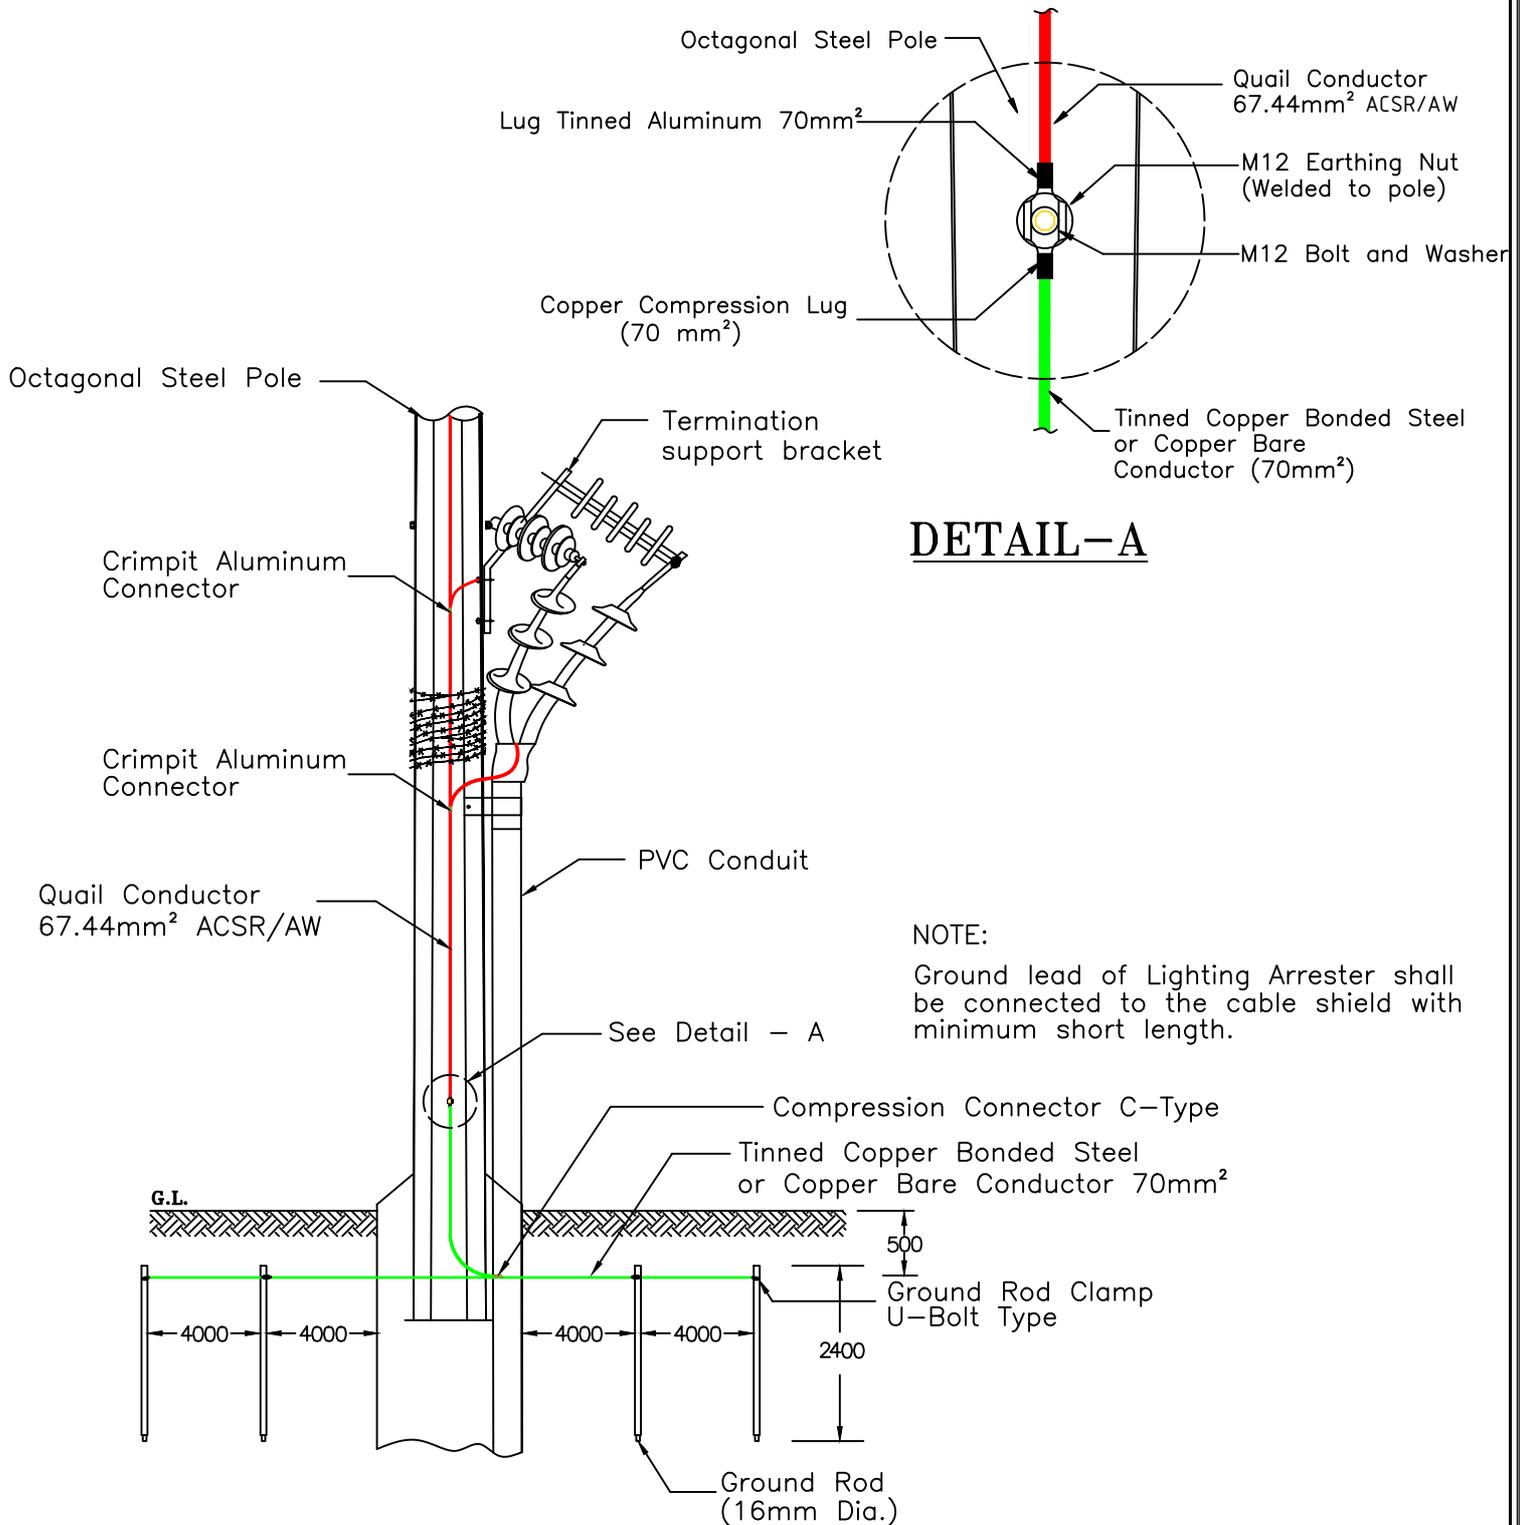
BONDING AND GROUNDING ARRANGEMENT CABLES CONNECTED TO 3-WIRE MV-O/H LINES
